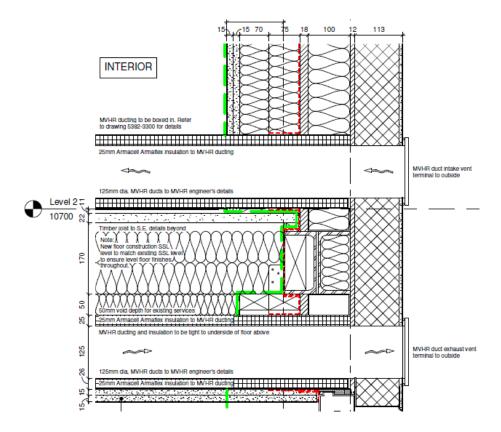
Typical MVHR vent detail, construction elements to the right of the green line are contractor's design portion (ECD Architects, 2013).
